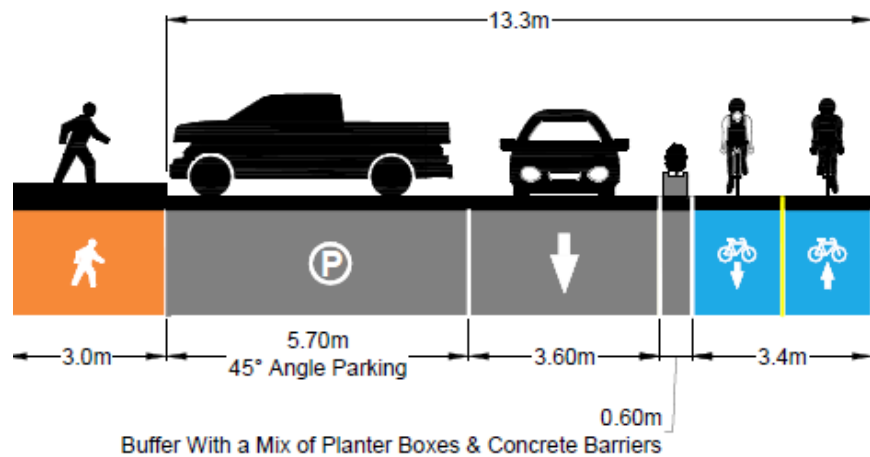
Two-Way Protected Bike Lane Retrofit on Pleasant Valley Boulevard from Mill Street to Bridge Street (Looking East)
